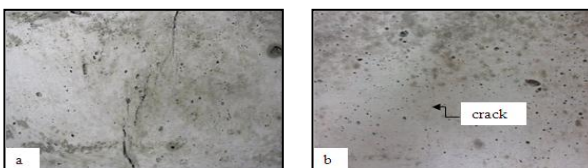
28 days SHCC beam, a) cracks at ultimate load state, b) cracks at 15 kN load.
